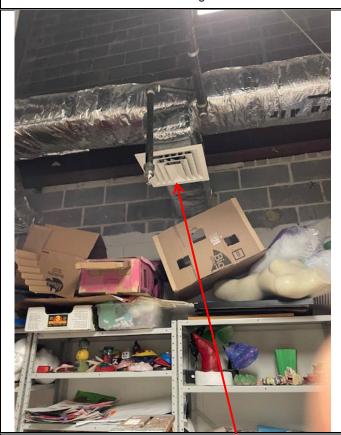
View of A173 Storage room. Ceiling level supply diffuser recently cleaned.
